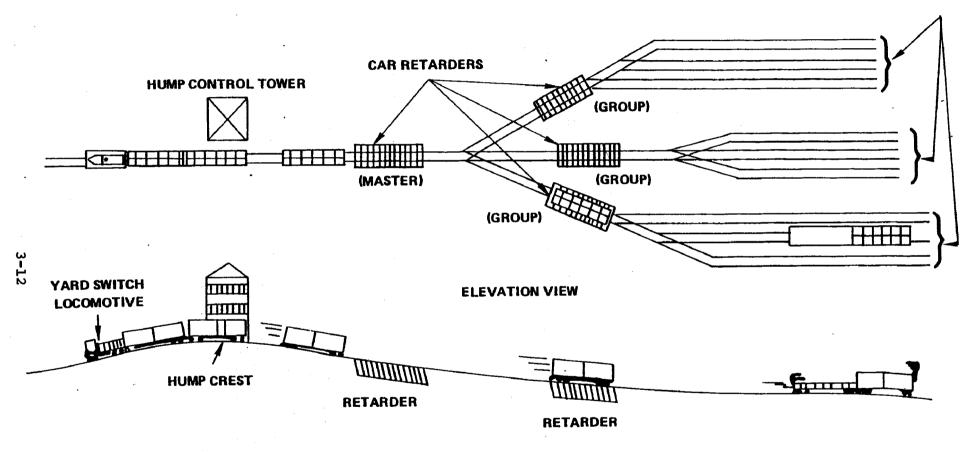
HUMP YARD CREST AND RETARDER SYSTEM
